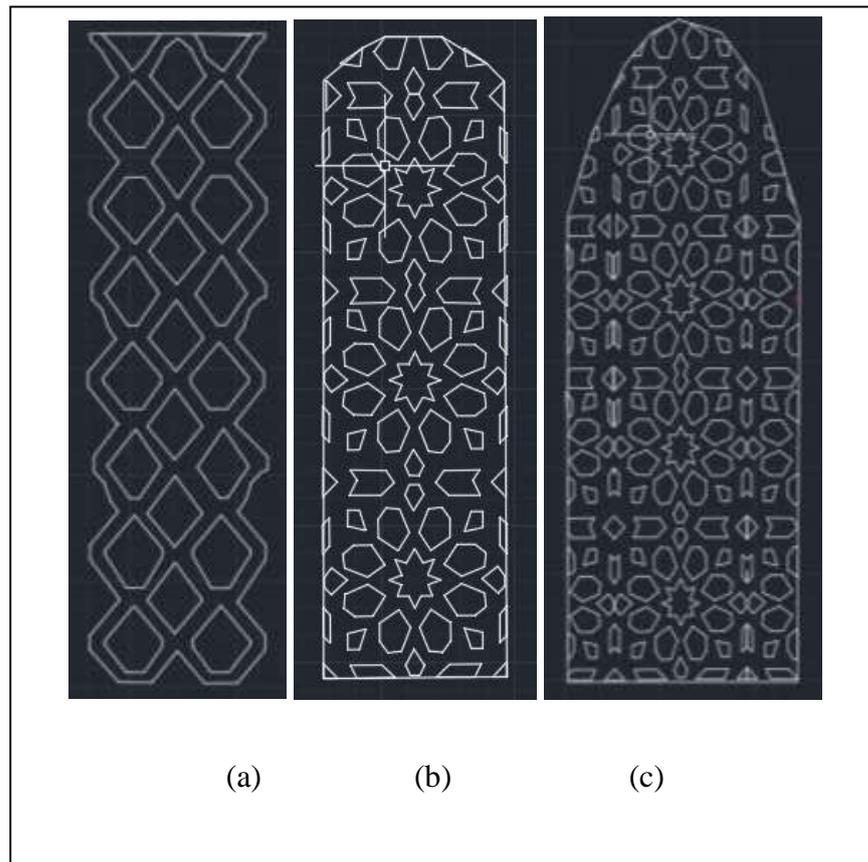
shows the three Mashrabia design used in the building (Author2021)
